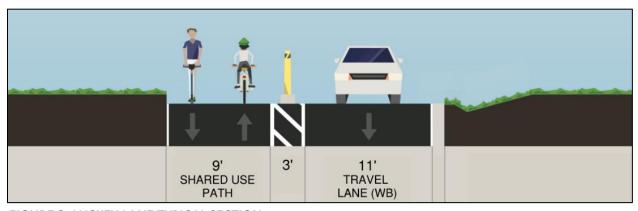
LUCKEY LANE TYPICAL SECTION
